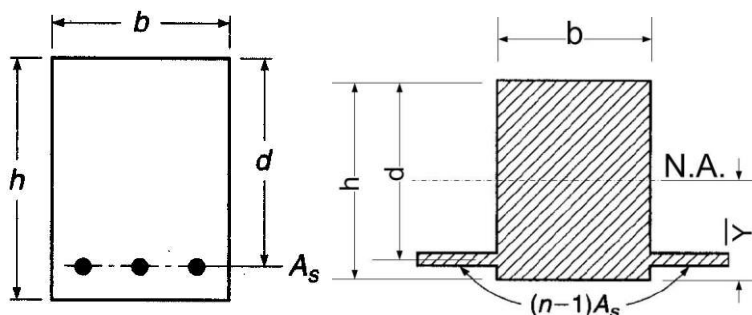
Beam of elastic uncracked section for Example 4.2-1.
